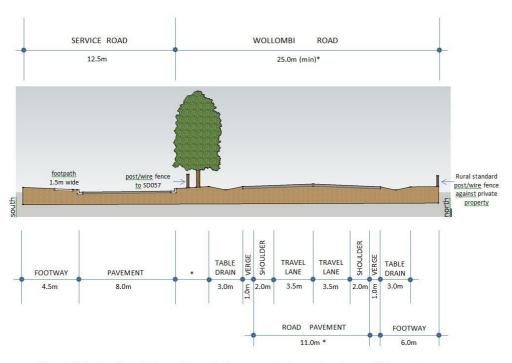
Typical cross sections "B" Wollombi Road, Farley.
